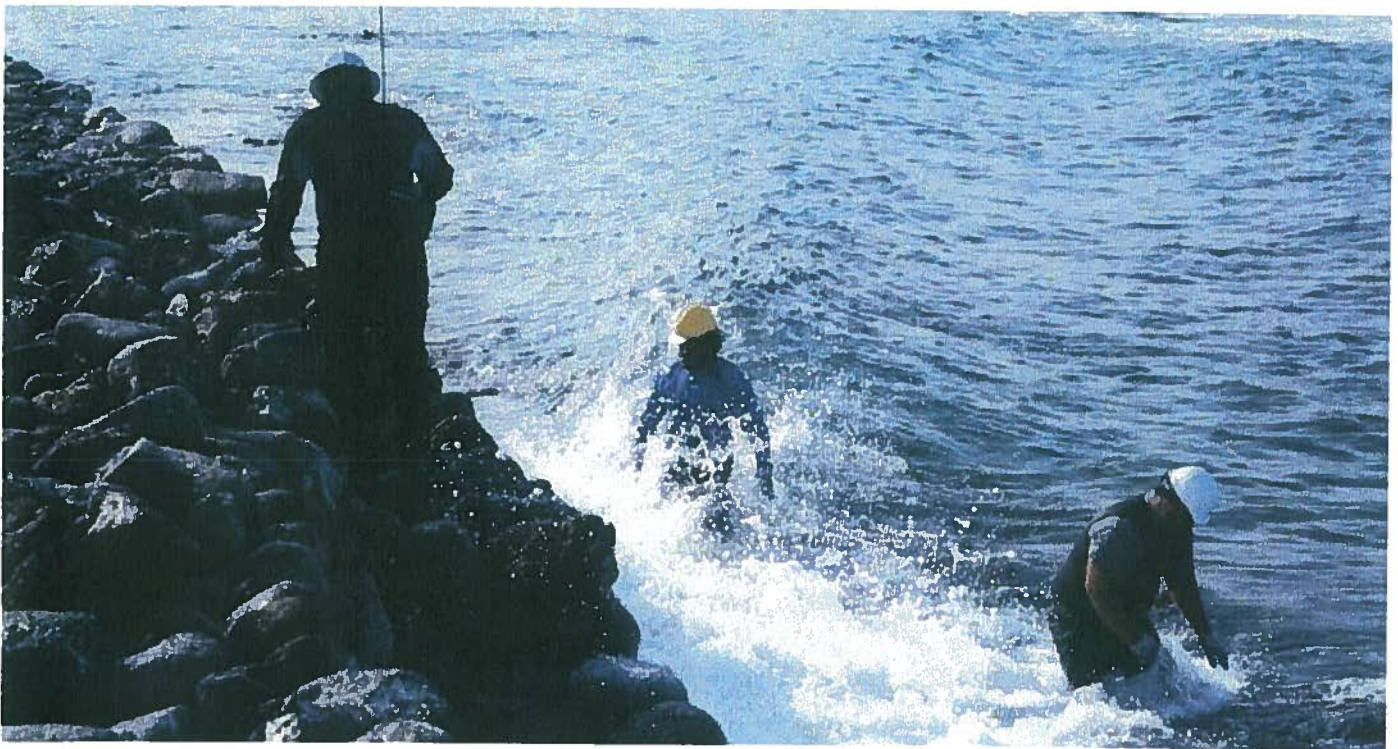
Kaloko-Honokohau NHP Masons working on the Kaloko Fishpond Wall.
